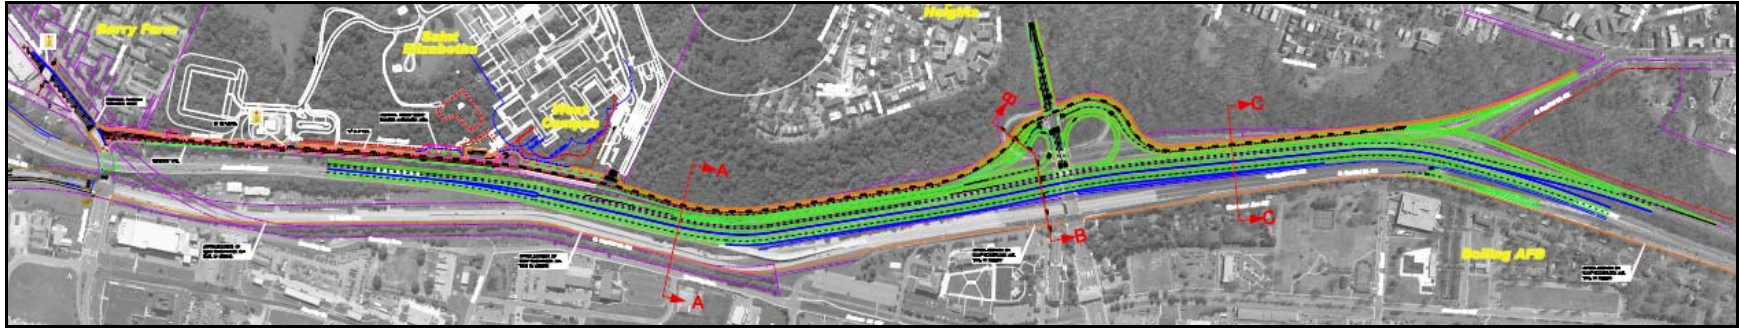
South Capitol Street Direct Access to the West Campus/One-way West Campus Access Road Considered but Eliminated from Detailed Study
